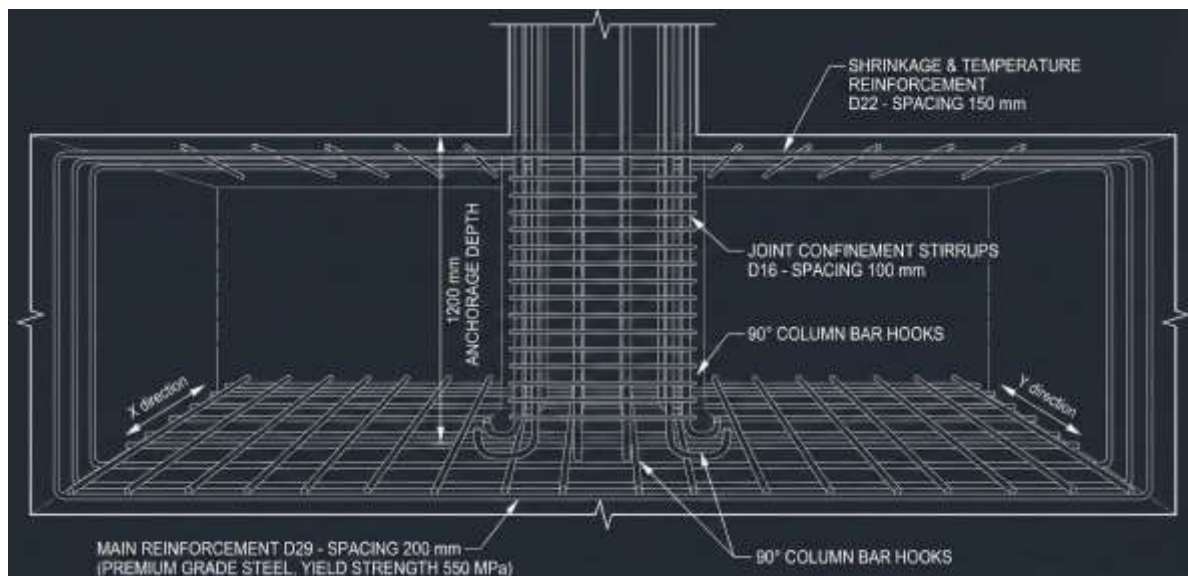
Details of Steel Reinforcement Cross-Sections for PC1 Type Pile Caps
